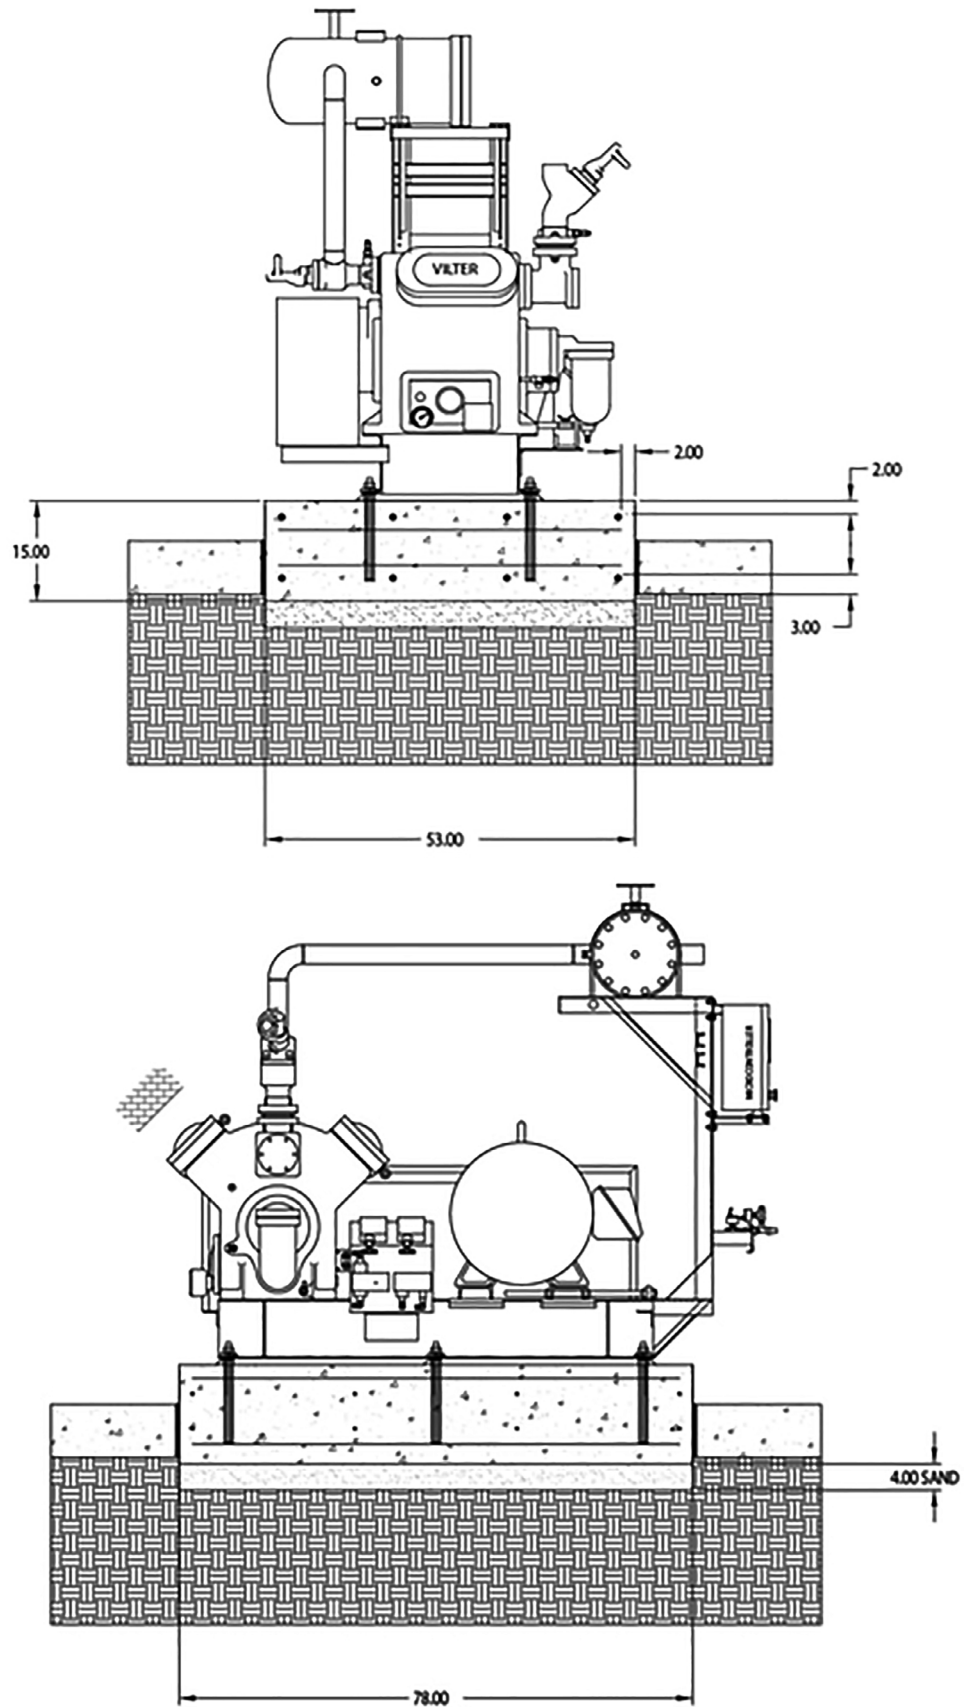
Compressor Unit and Foundation Dimensions – 4 Cylinder (2 of 6)
